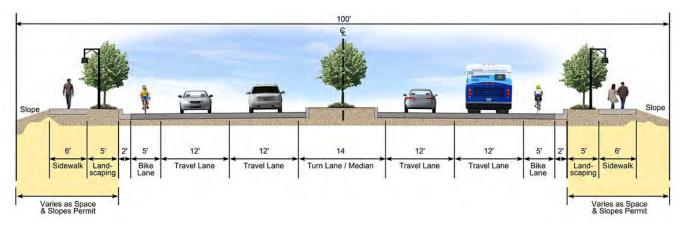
El Rancho Drive to 1st Avenue Cross Section
